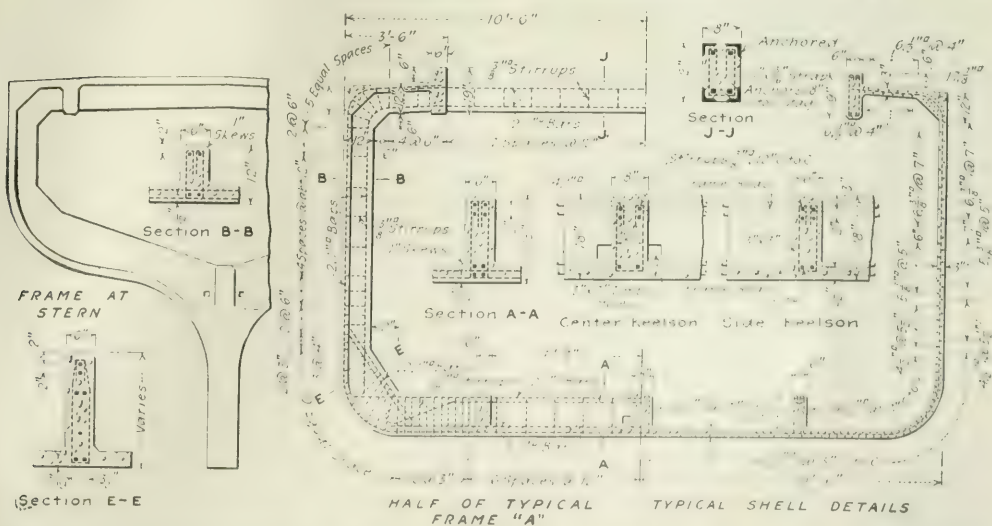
CONCRETE BARGE SECTION OF REINFORCED CONCRETE GIRDER FRAMES CARRYING THREE-INCH SHELL
